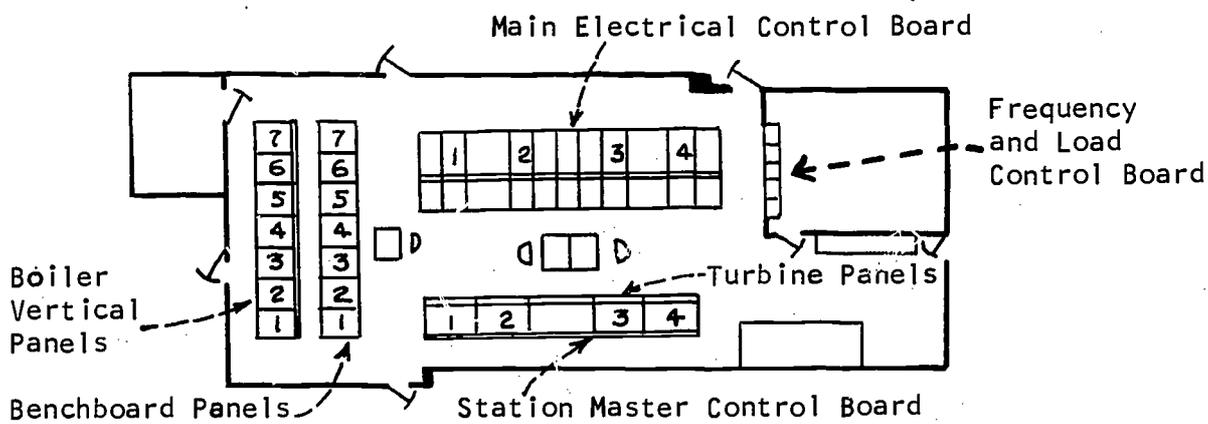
LAYOUT OF CONTROL ROOM IN CENTRALIZED PLANT
